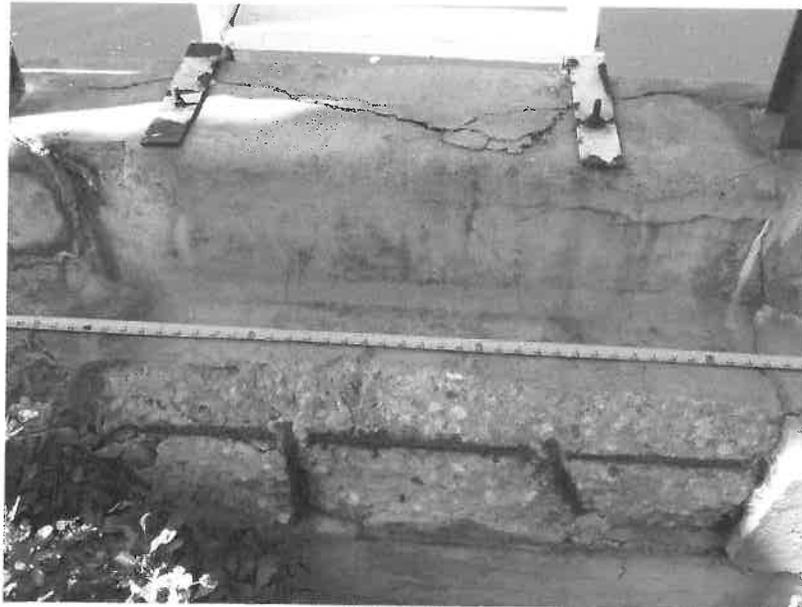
8, Naples, Top Deck Survey: Rivo Alto Canal, #185
